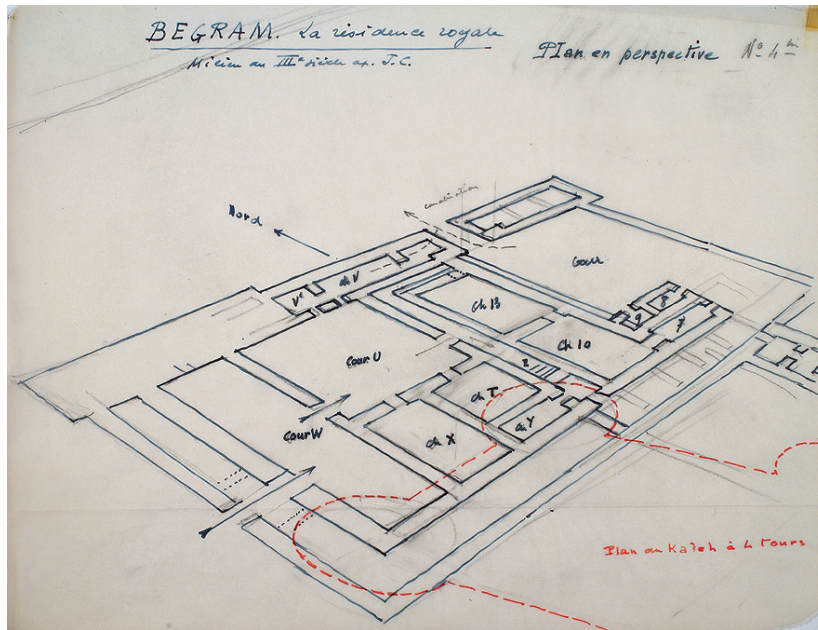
RECONSTRUCTED ARCHITECTURAL VIEW OF THE BUILDING AND POSITION OF ROOMS 10 AND 13 (DRAWING BY PIERRE HAMELIN).
